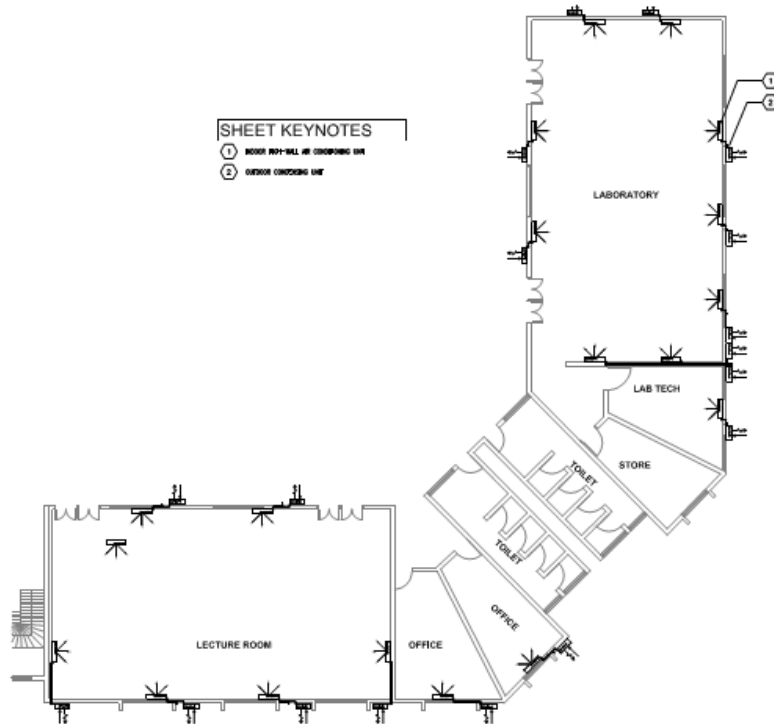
Mini-Split System Division 1 Ground Floor Plan
